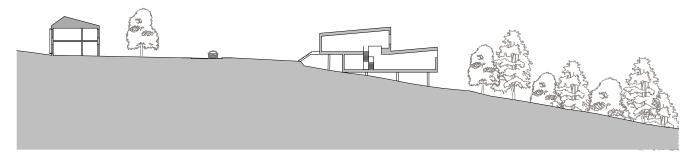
Section through hillside dwellings, Collective Architecture 2010. Not to scale.
